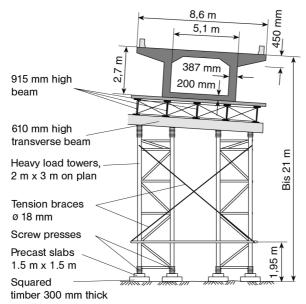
Scaffolding collapse during construction of a bridge in East Chicago. 1982, Case 11.33 a) system
